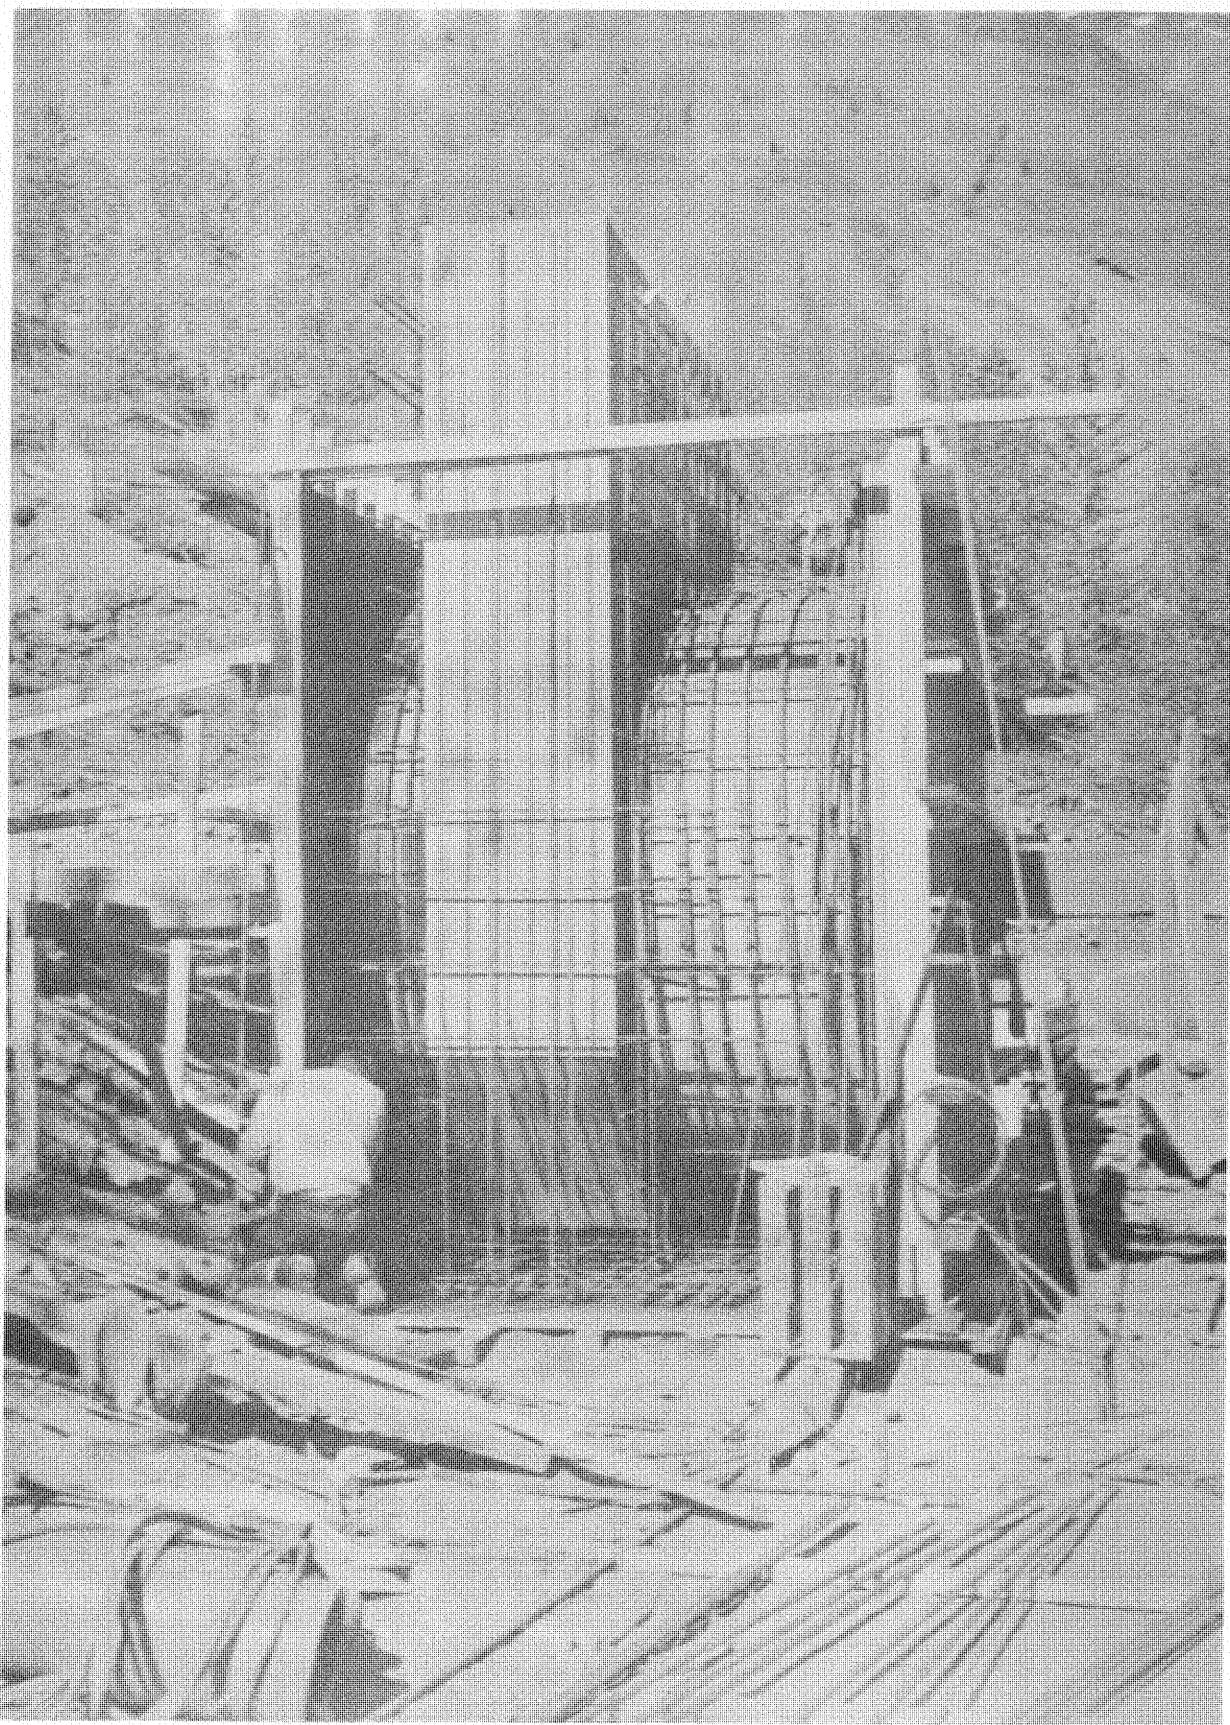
Bulkhead section of intake structure--Reinforcement steel being placed prior to concrete placement. P783-908-914, June 18, 1952.
